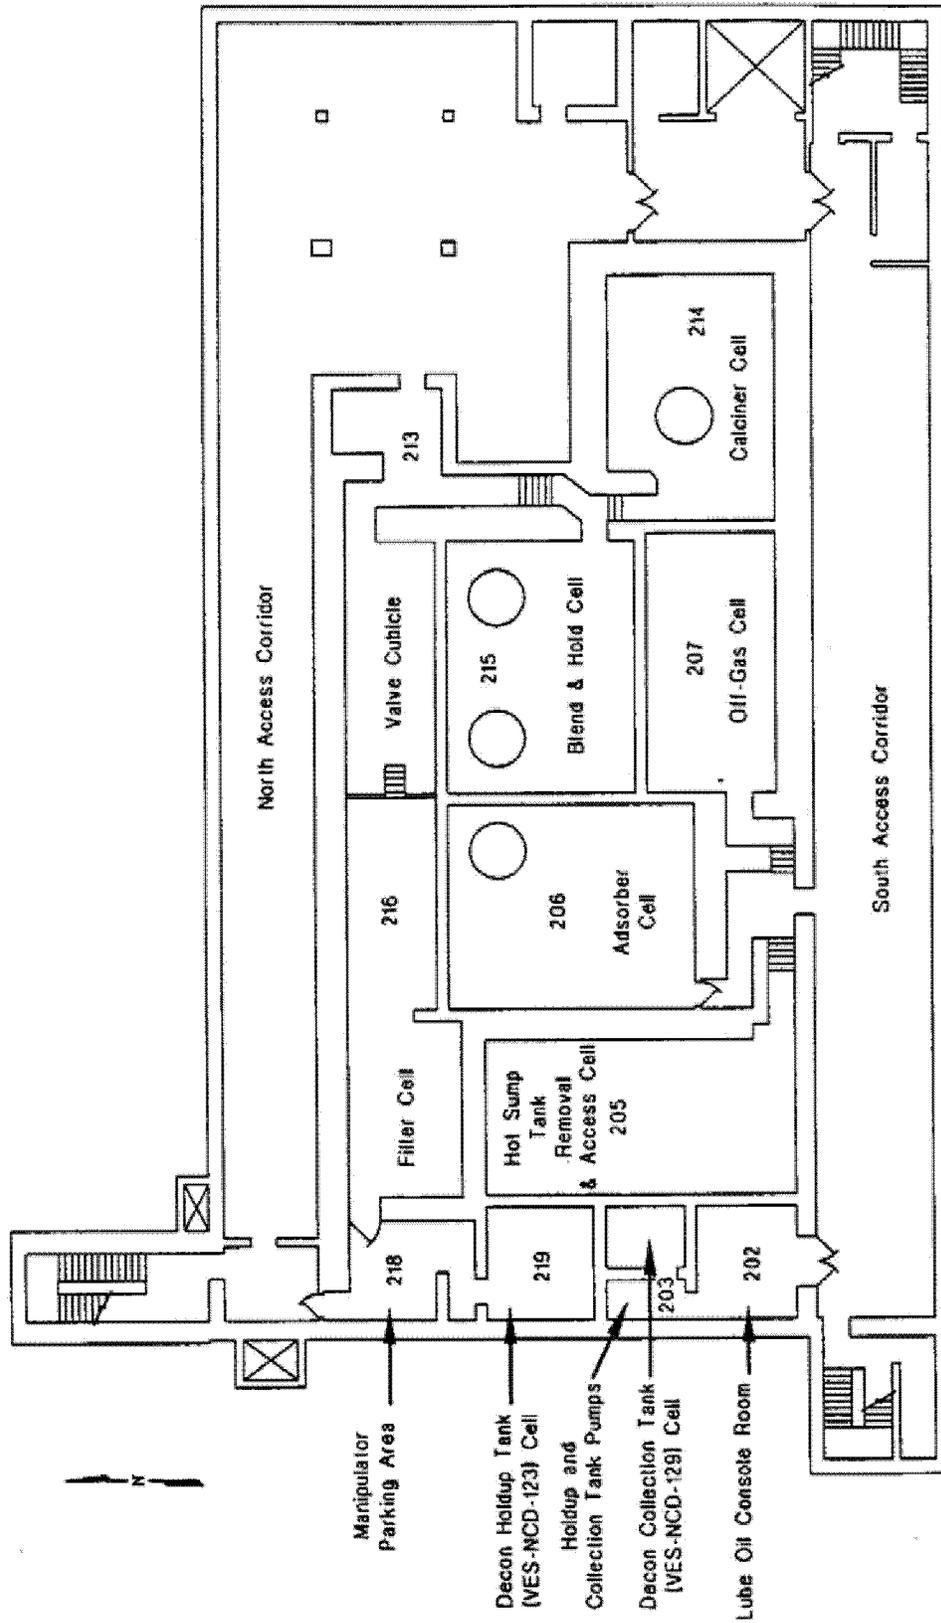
Simplified Floor Plan for First Level of CPP-659.
